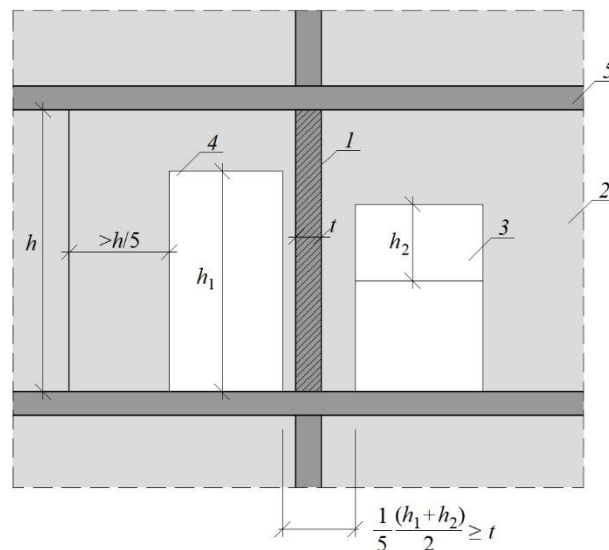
Minimum length of stiffening wall with openings: 1 – stiffened wall, 2 – stiffening wall, 3 – window opening, 4 – door opening, 5 – slab
